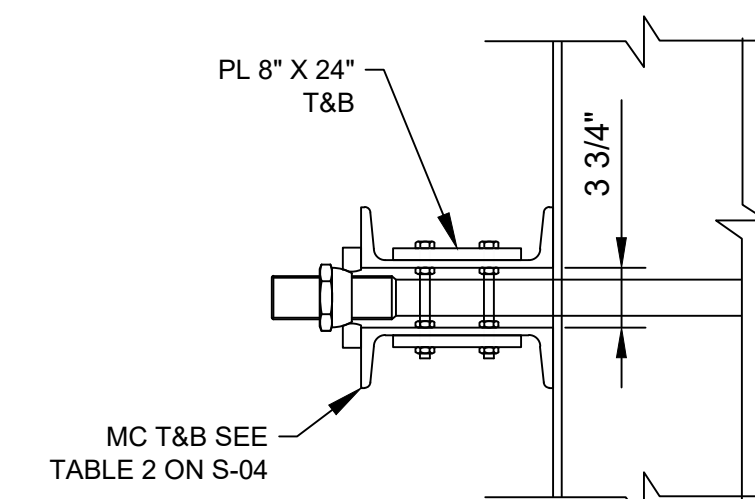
CORNER CONNECTOR ALTERNATIVE B
